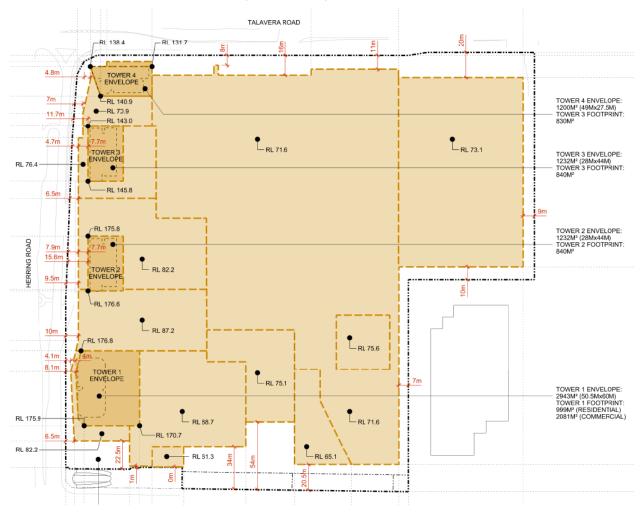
SITE PLAN CONTROL DRAWING (SOURCE: AJ+C)
